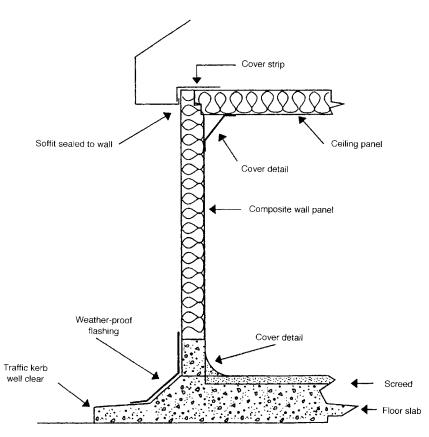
Outside wall configuration showing a well-sealed structure with elevated factory floor level.
